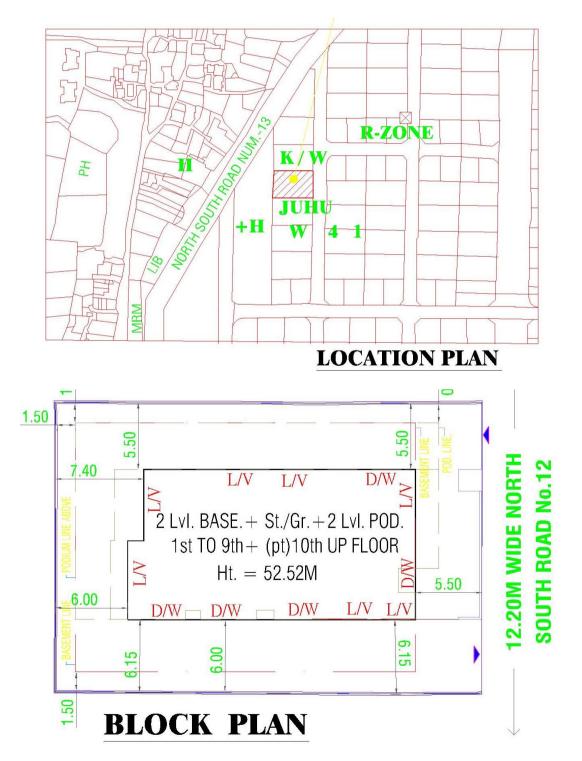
Location Plan & Block Plan of the Proposed Site
